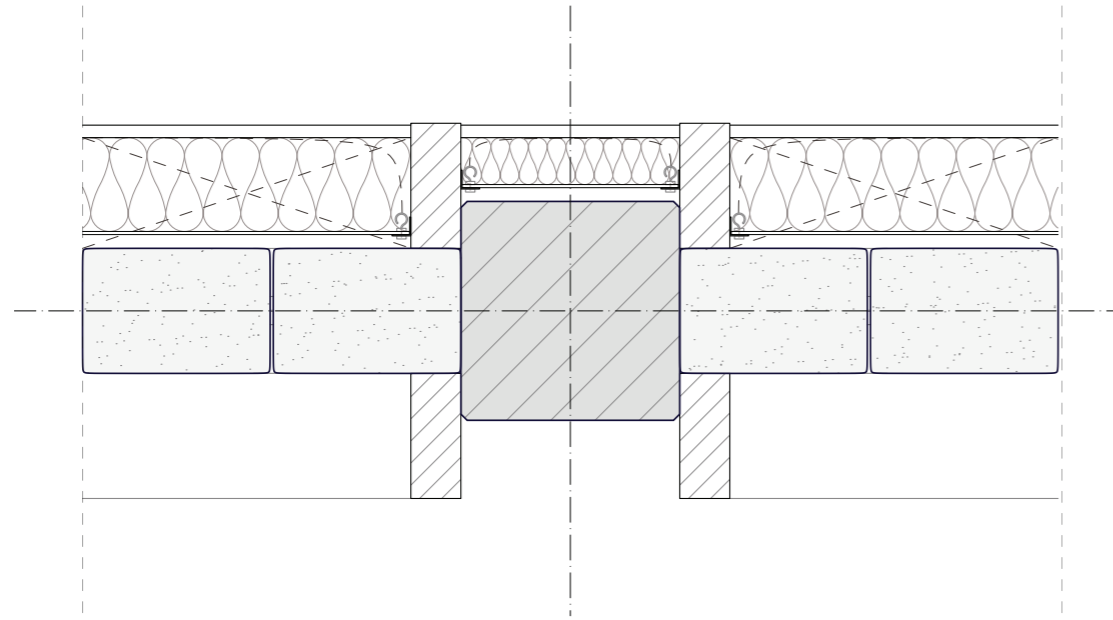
| Detail A. New wall, existing concrete column, timber framework, rammed demolition waste blocks, metal mesh, reed insulation, loam finish
